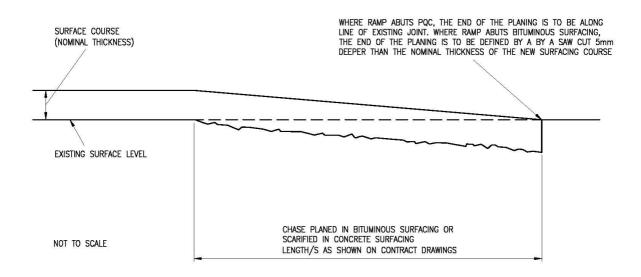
Ramps between Surface Course and Existing Pavements
